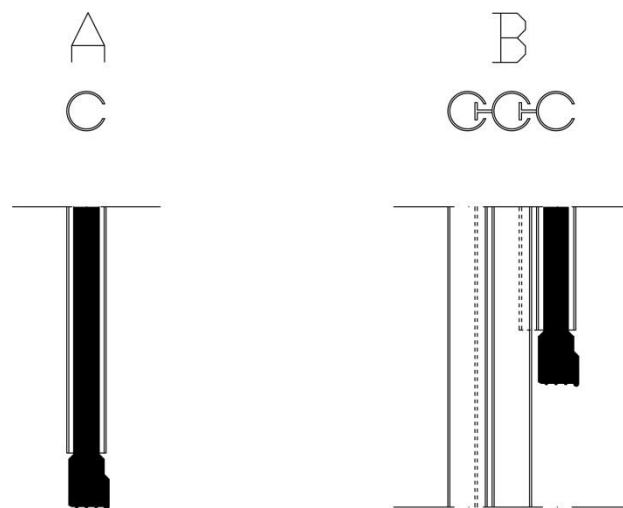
Installation of a CT micropile wall: the first pile is type of C and the following piles are drilled using CT profiles (Lehtonen 2013).
